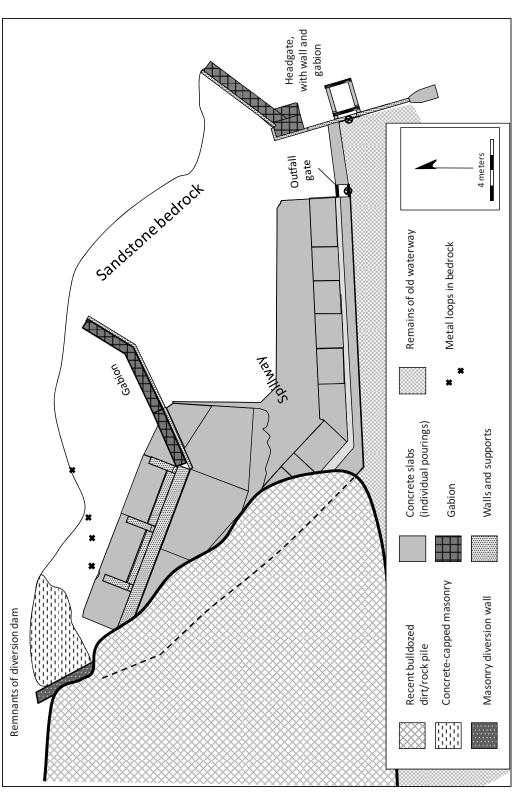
Overview of spillway and headgate, showing remnants of diversion dam (masonry wall with concrete-capped masonry armoring), outfall, and headgate.
